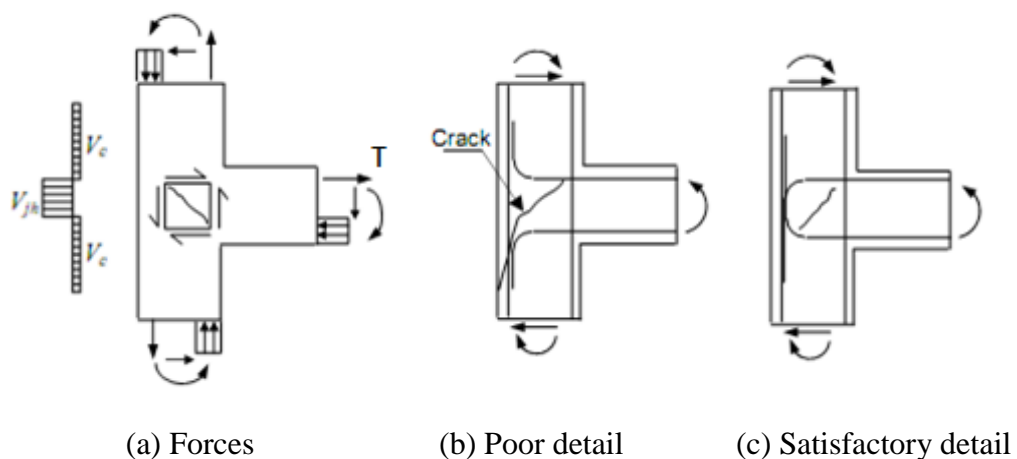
Forces and Detailing Requirement for Exterior Joint
